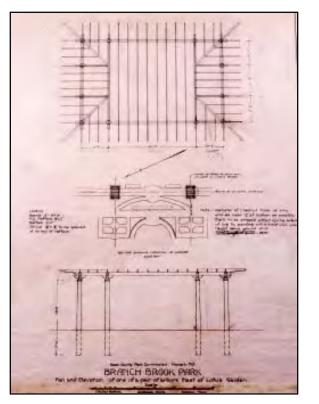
Plan and Elevation of one of a pair of Arbors, east of the Lotus Garden, Plan #2121-237, 15 August 1899.
